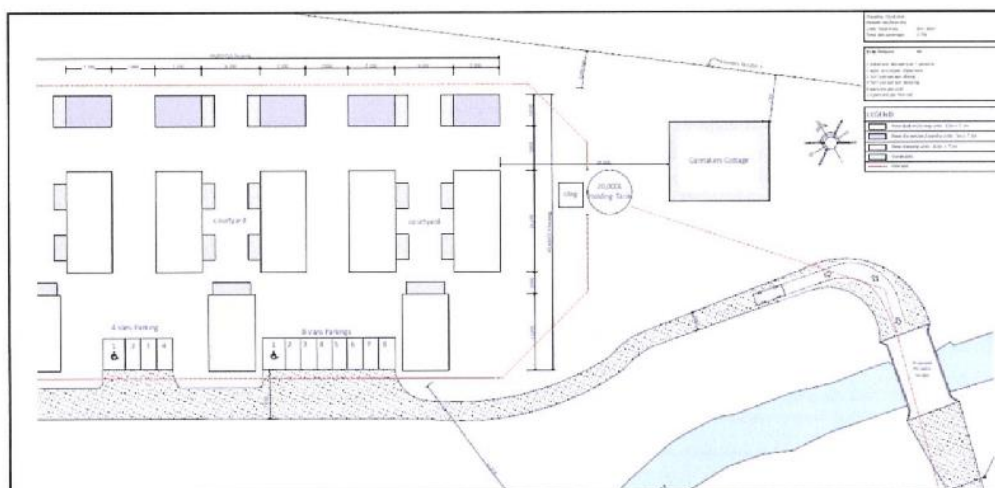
The Layout of the Proposed RSE Accommodation and Ancillary Buildings
